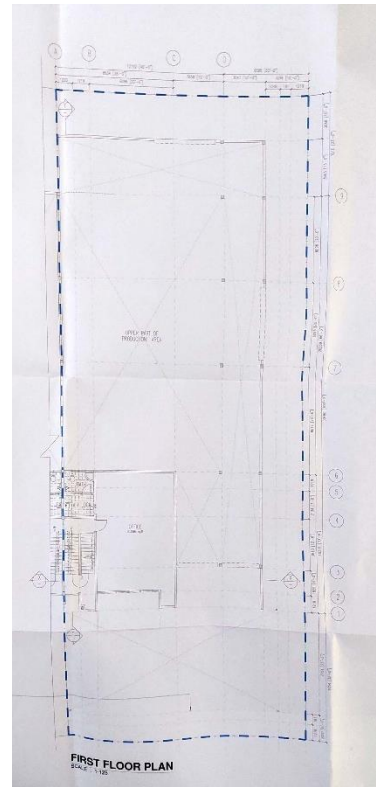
First floor plan of Boon Lee Auto SDN. BHD
